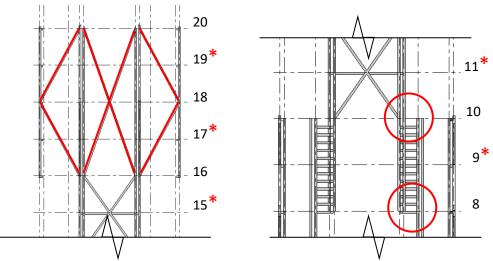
Proposal Structural Design: Interior 'Central Core' Elevation
